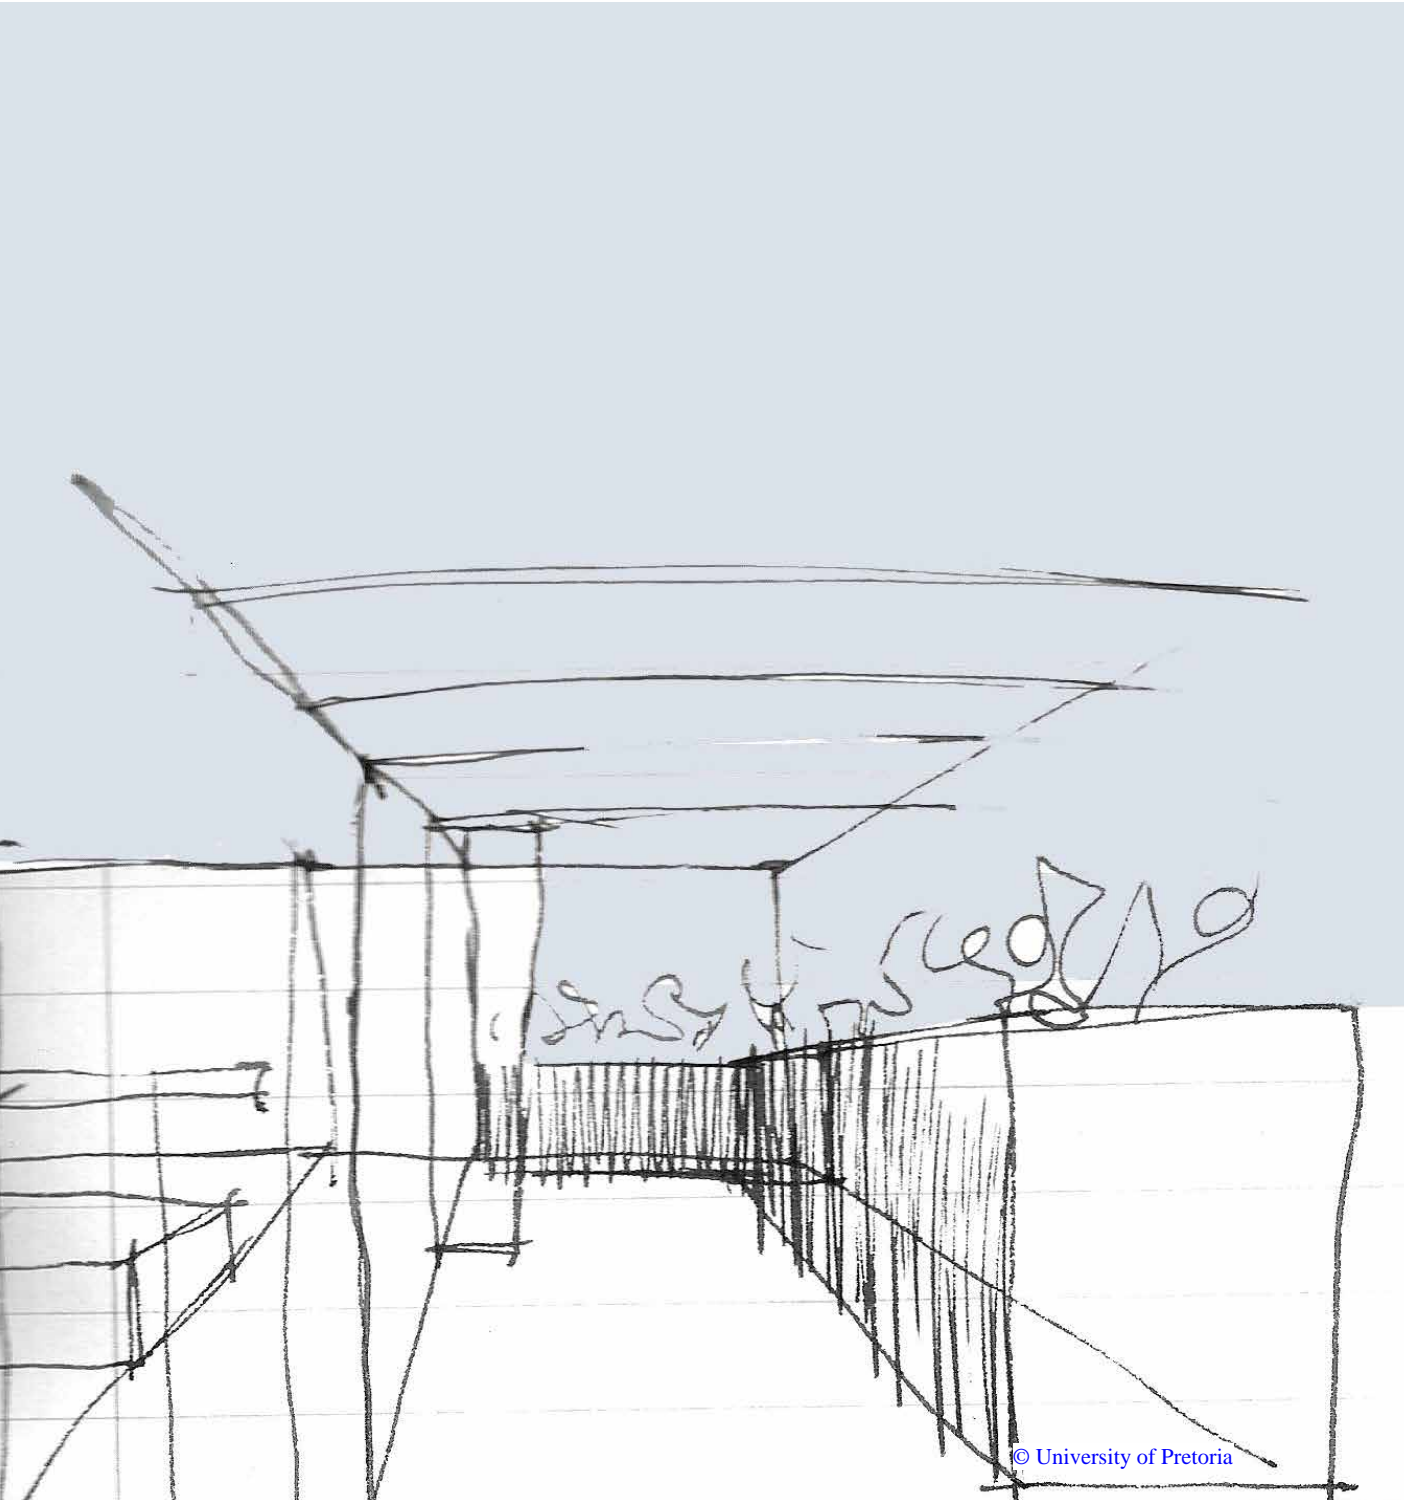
Conceptual first floor walkway (Patrick: 2016)
